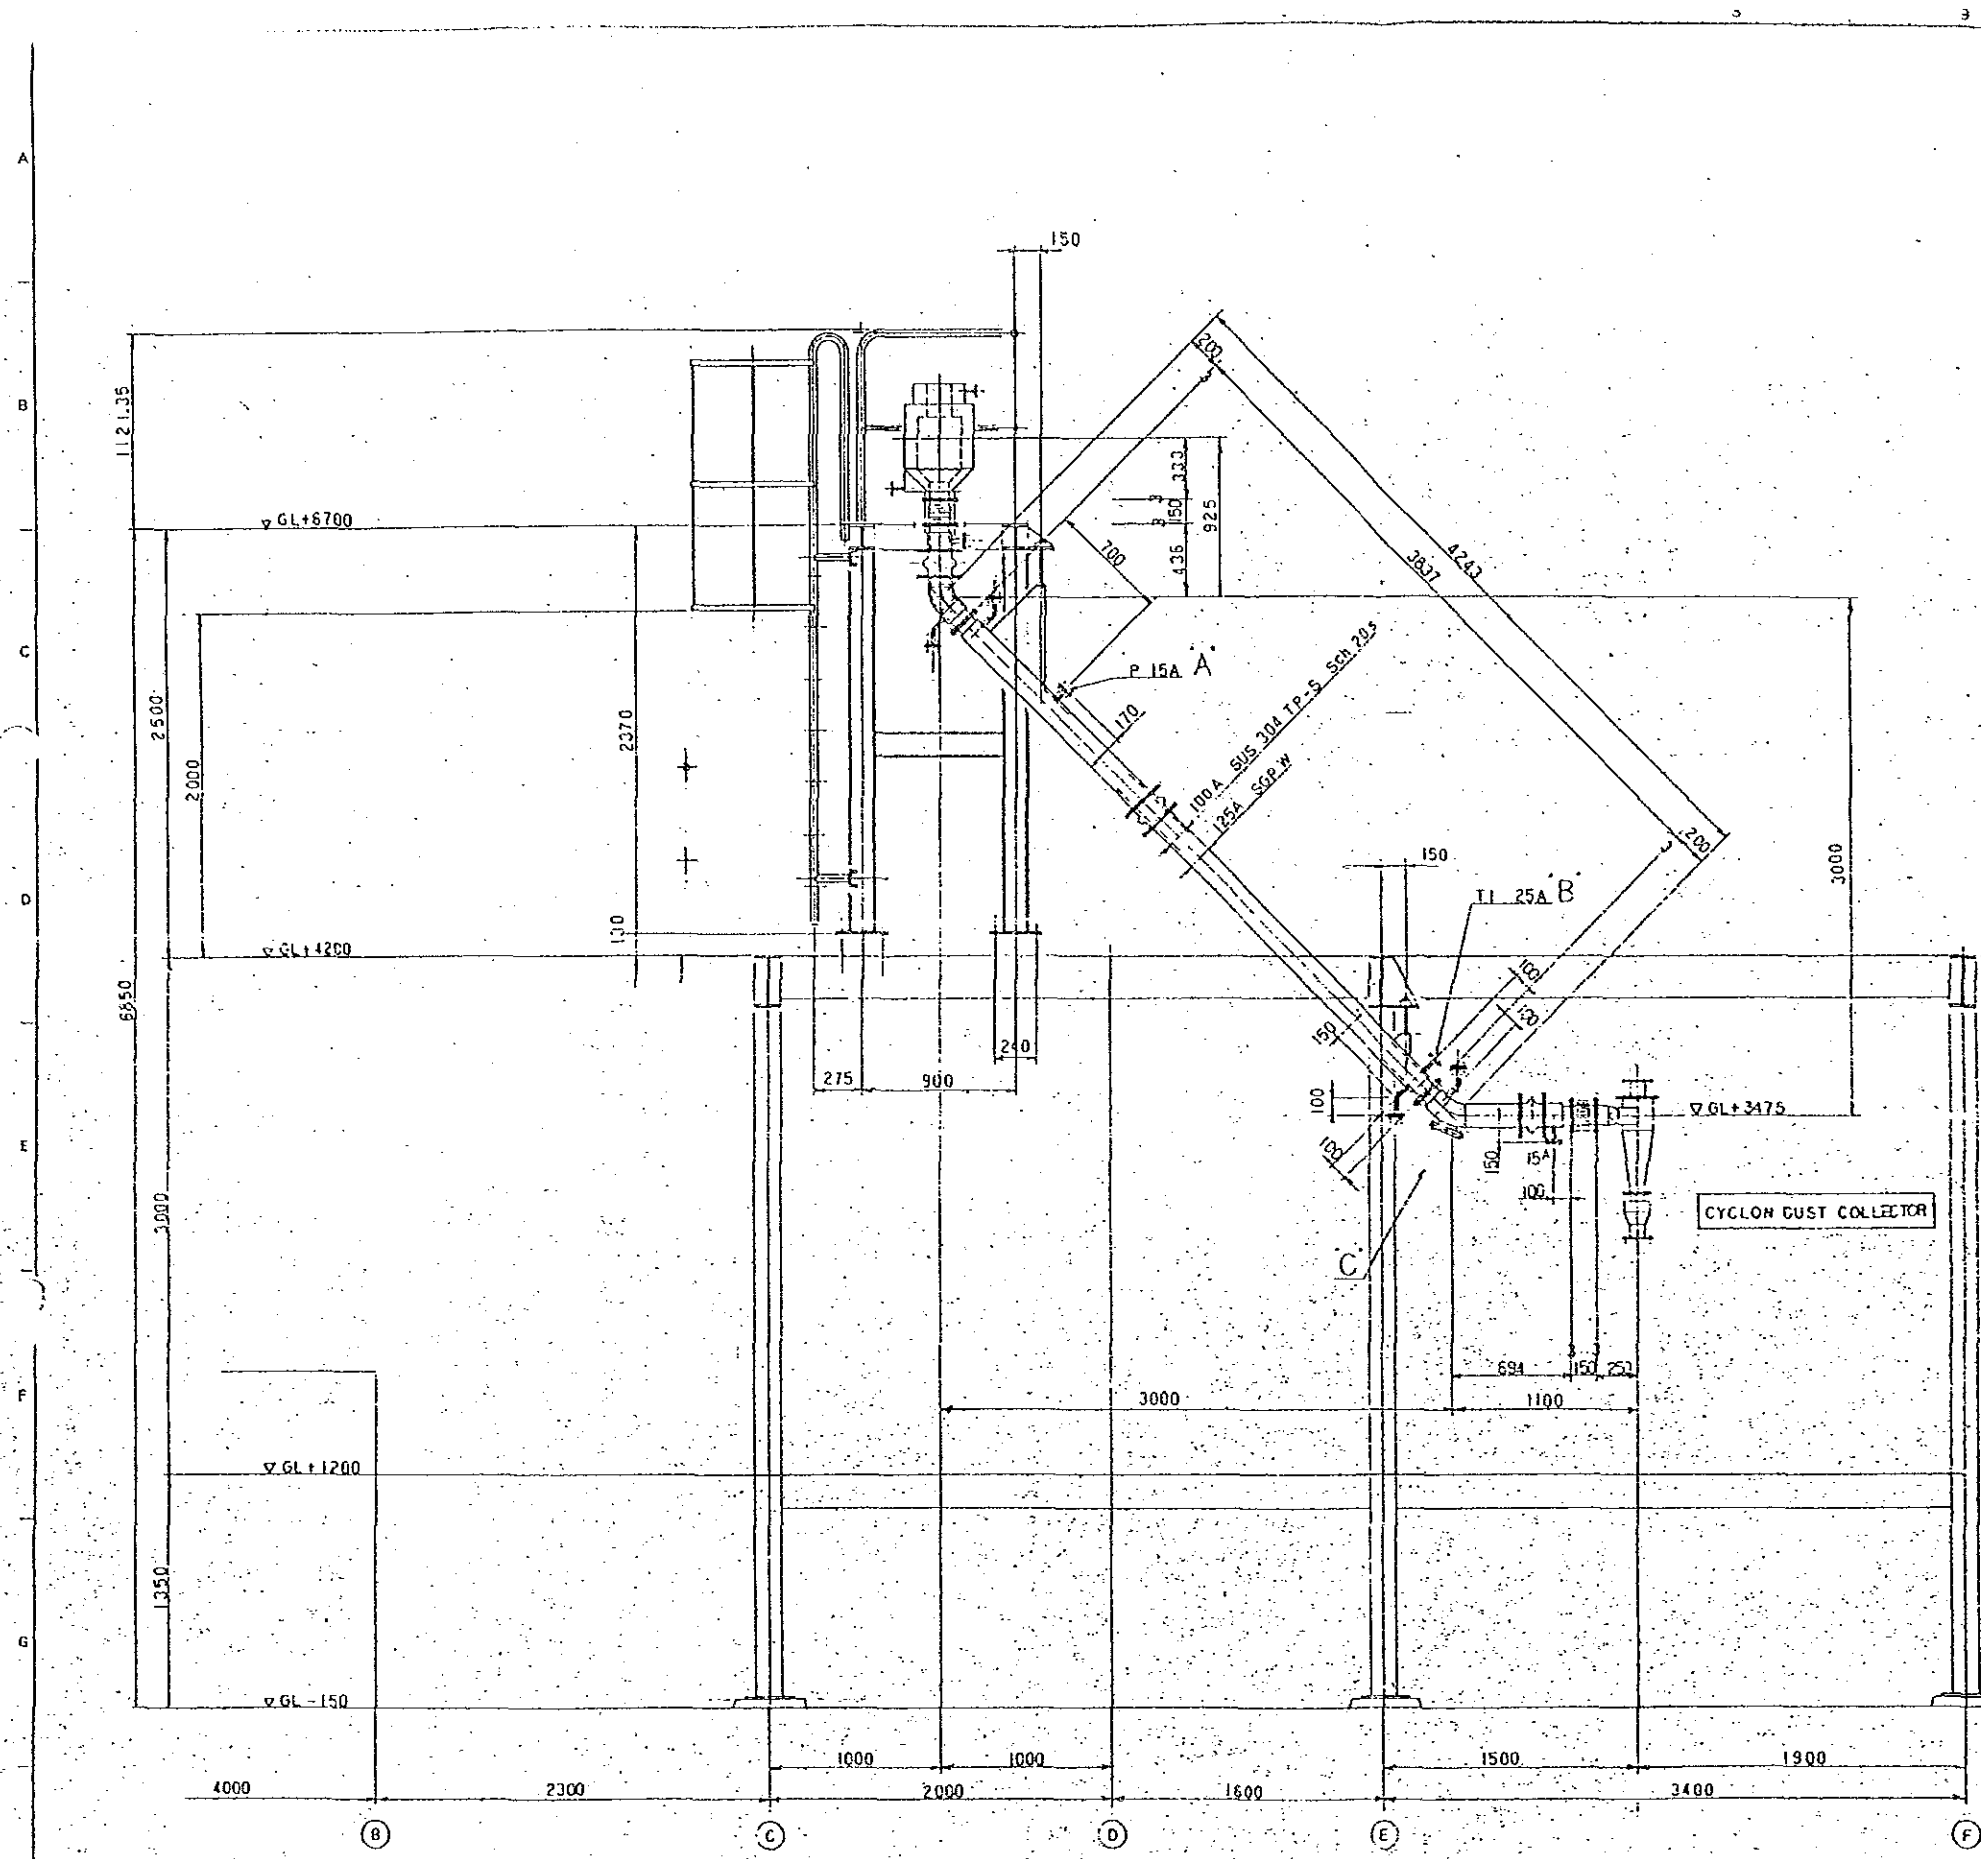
Assemble drawing of produced gas filtration system(2)
